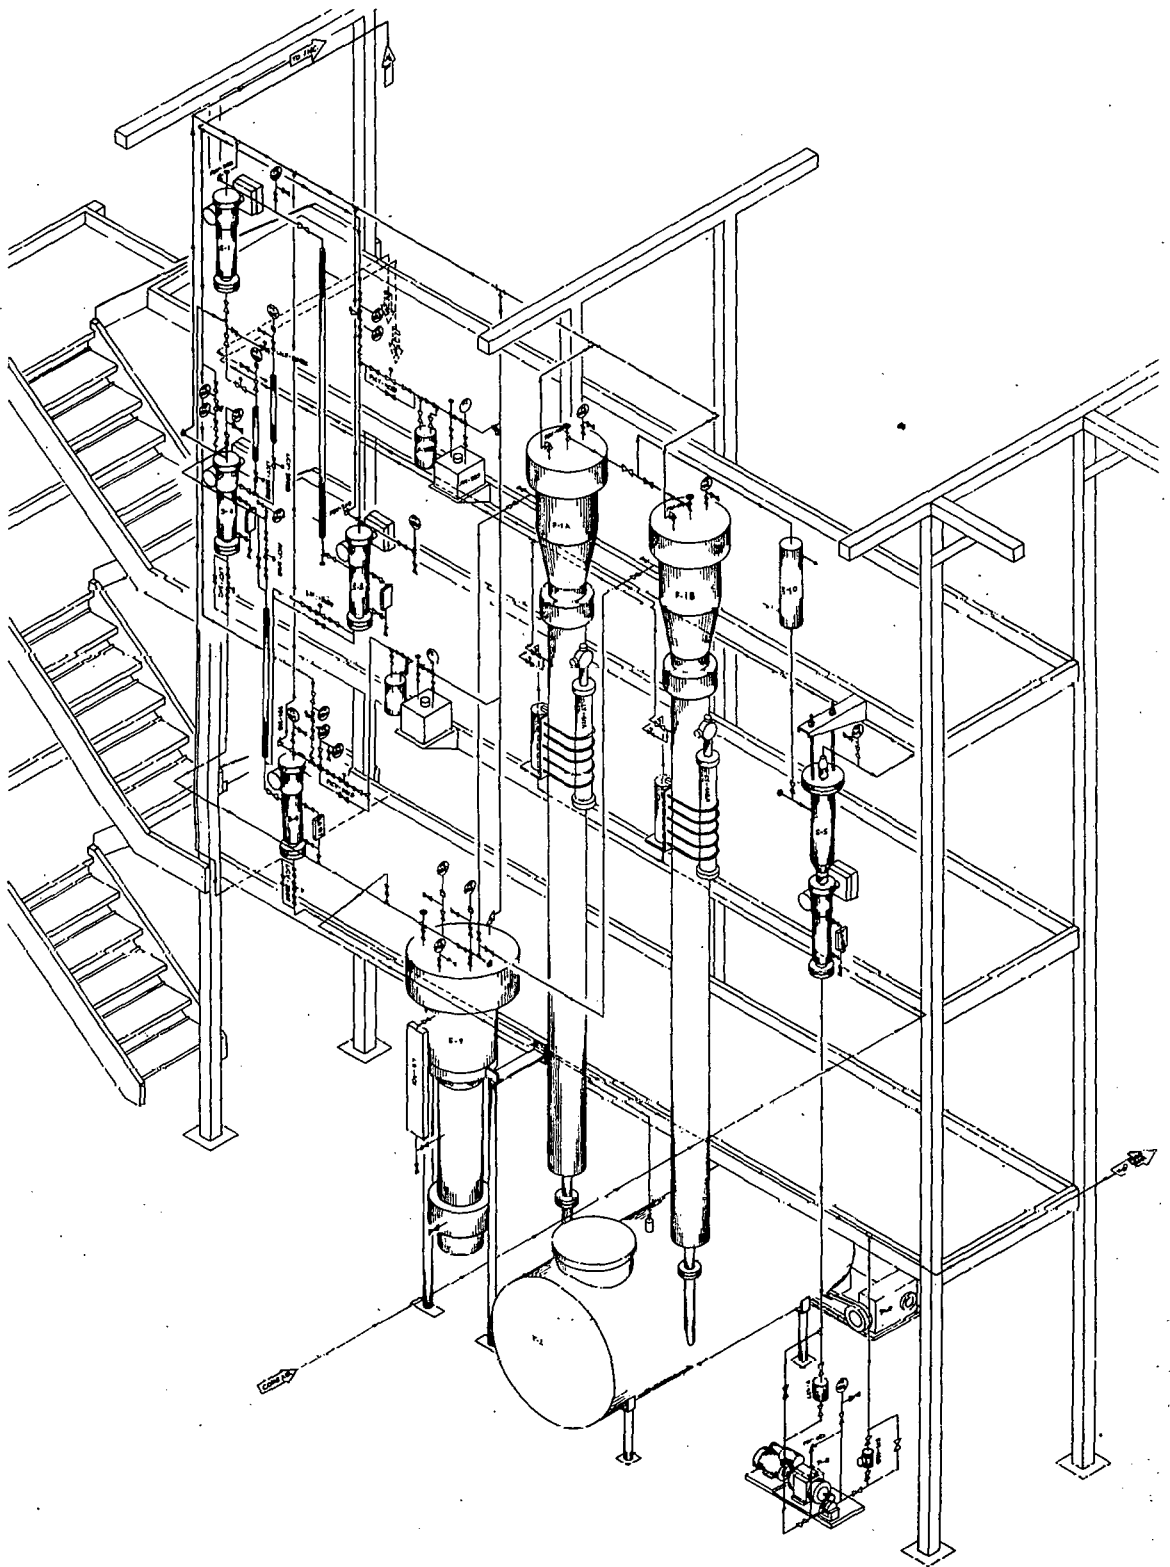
Isometric drawing of the center work platform with the slurry recovery and concentrating equipment mounted on the east side.
